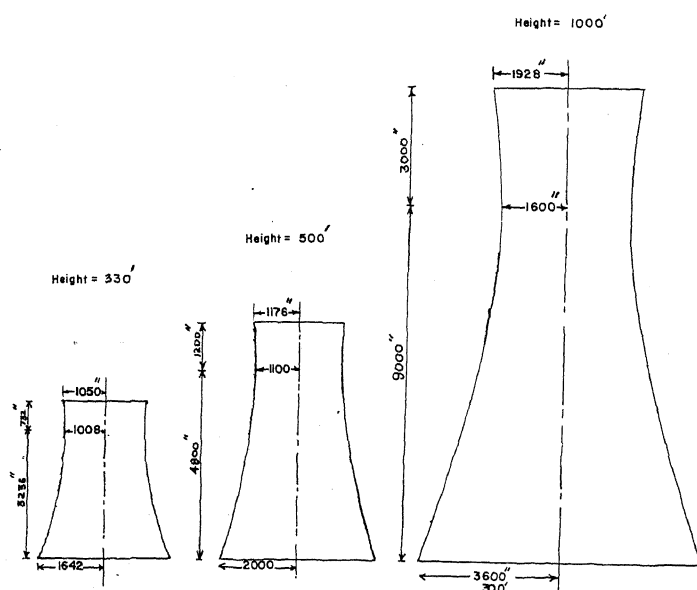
GEOMETRY OF TYPICAL COOLING TOWERS
